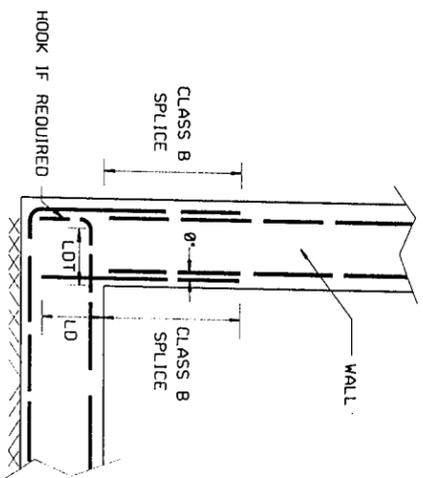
EXTERIOR WALL & GRADE SLAB
